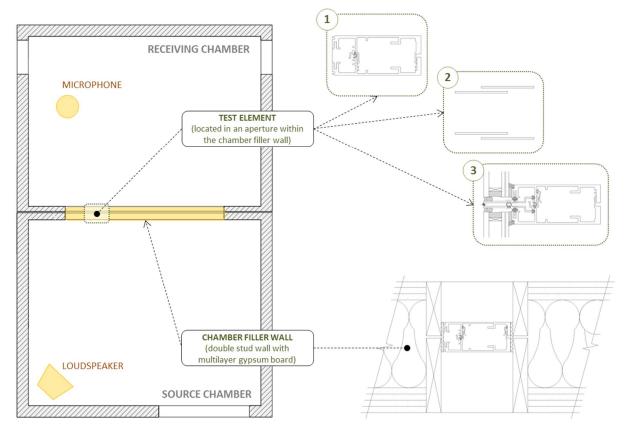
DIAGRAM PLAN DRAWINGS OF THE TRANSMISSION LOSS CHAMBER AT WEAL AND THE TEST ELEMENTS FROM THE CURTAIN WALL SYSTEM.
